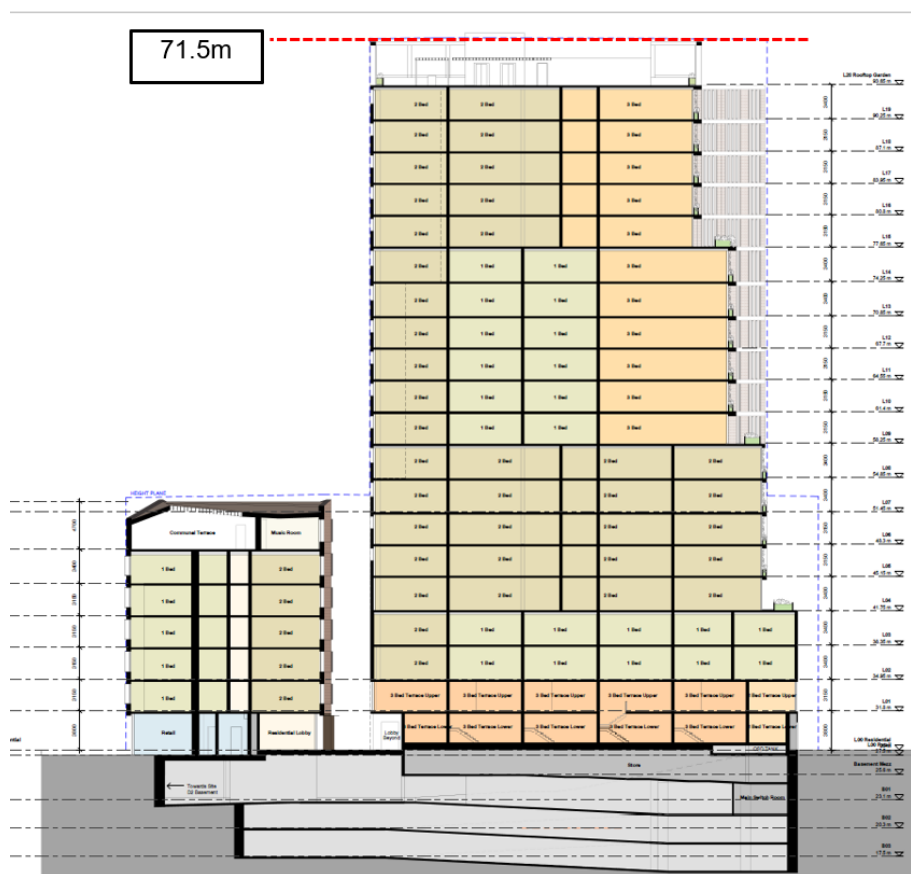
Section plan showing Tower Building relative to height of buildings standard (dotted red line)
